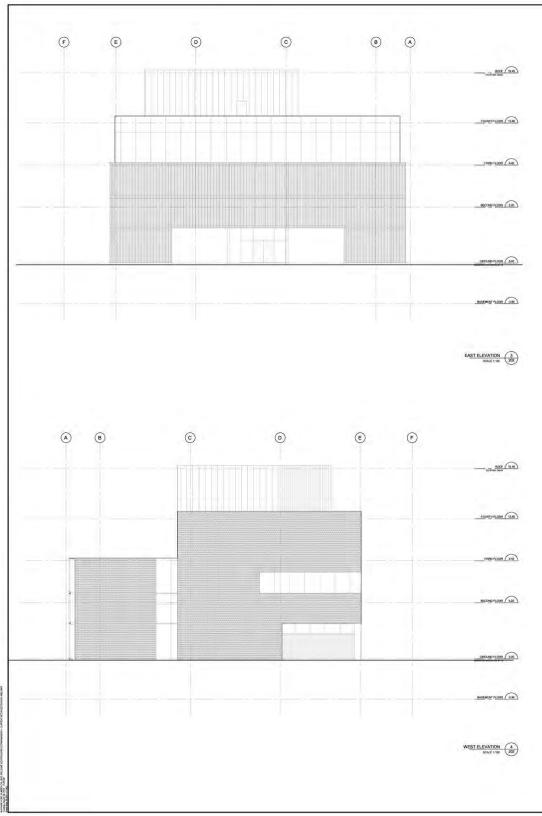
Humber College Welcome Centre – Elevations (23 June 2014)
